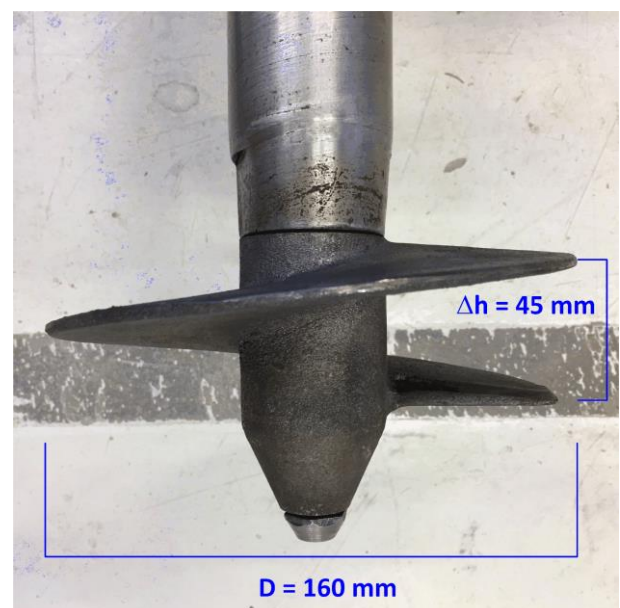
Screw plate with diameter $D = 160$ mm and pitch of 45 mm used at the Halden GeoTest Site.
